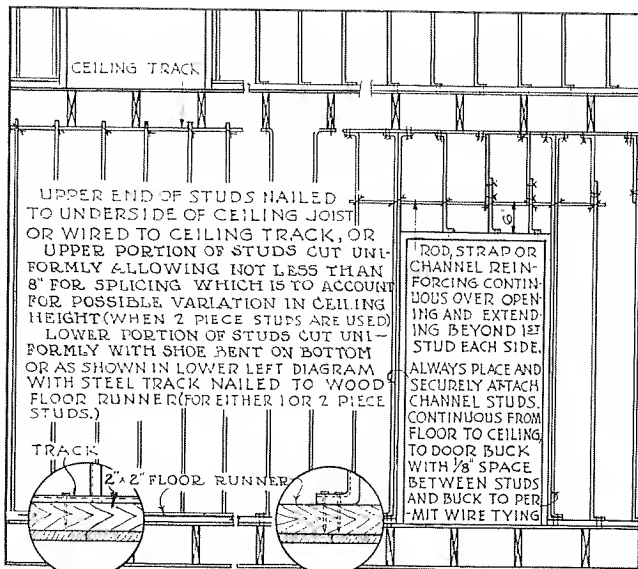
Solid Partitions in Wood-Joisted Building; Ceiling Joists PERPENDICULAR to Partition.
